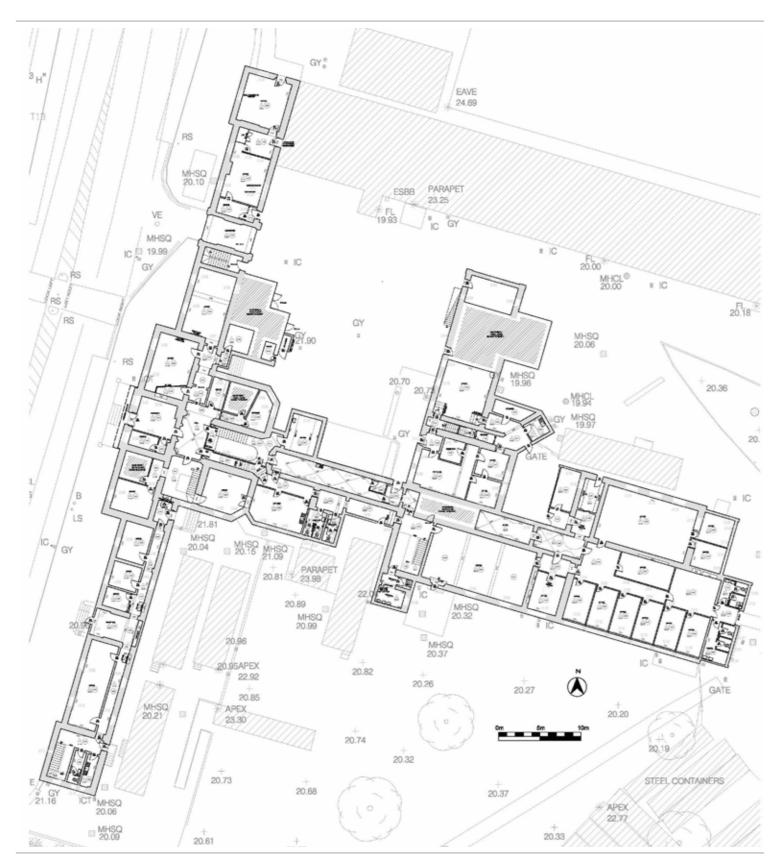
4 Ground floor plan of Clock Tower Building (former penitentiary) as existing from survey
